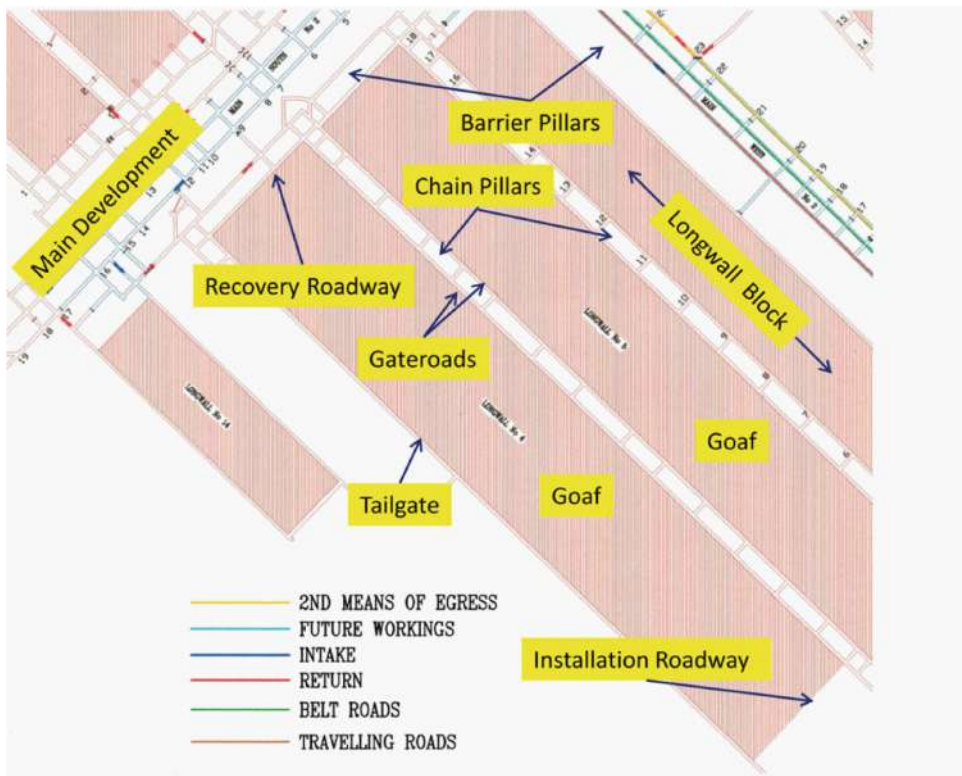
Simplified longwall mining layout showing the major infrastructure
